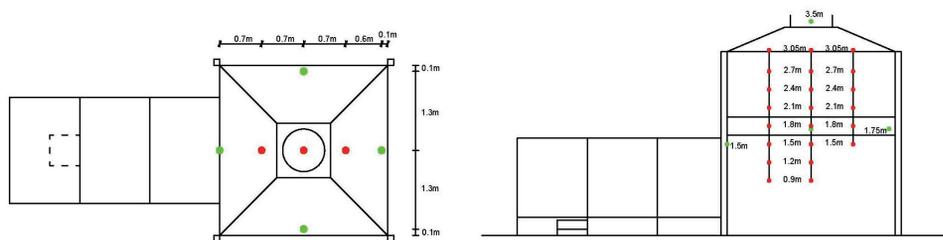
Positions of thermocouples; top view (left) and side view (right)
